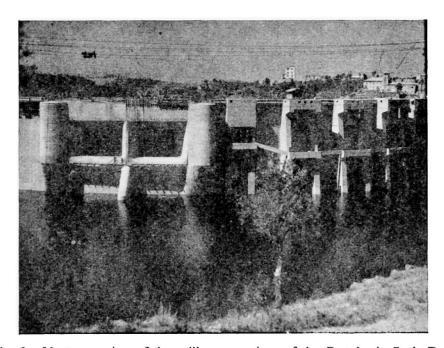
Upstream view of the spillway openings of the Castelo do Bode Dam
